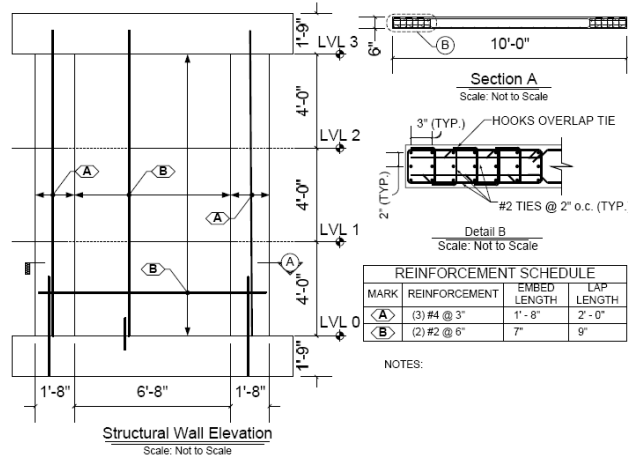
NEESR UW wall tests (Lowe et al, 2011)
